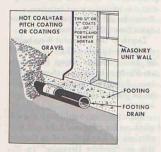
A footing drain prevents the accumulation of water around basement walls. them. Branch drains may be laid to take care of any springs that may appear when the excavation is completed.
